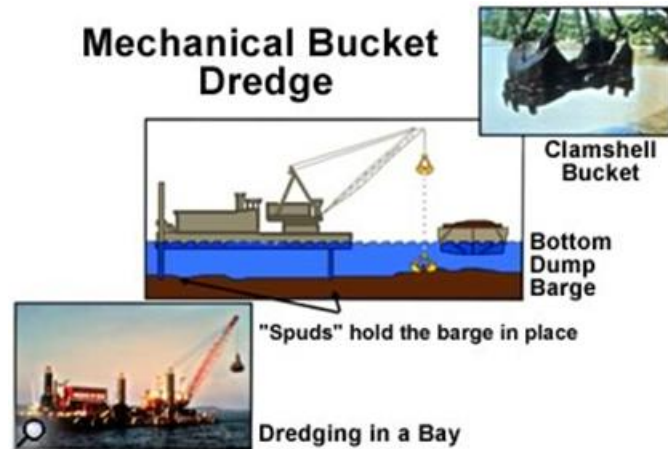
Mechanical Bucket or Clamshell Dredge
